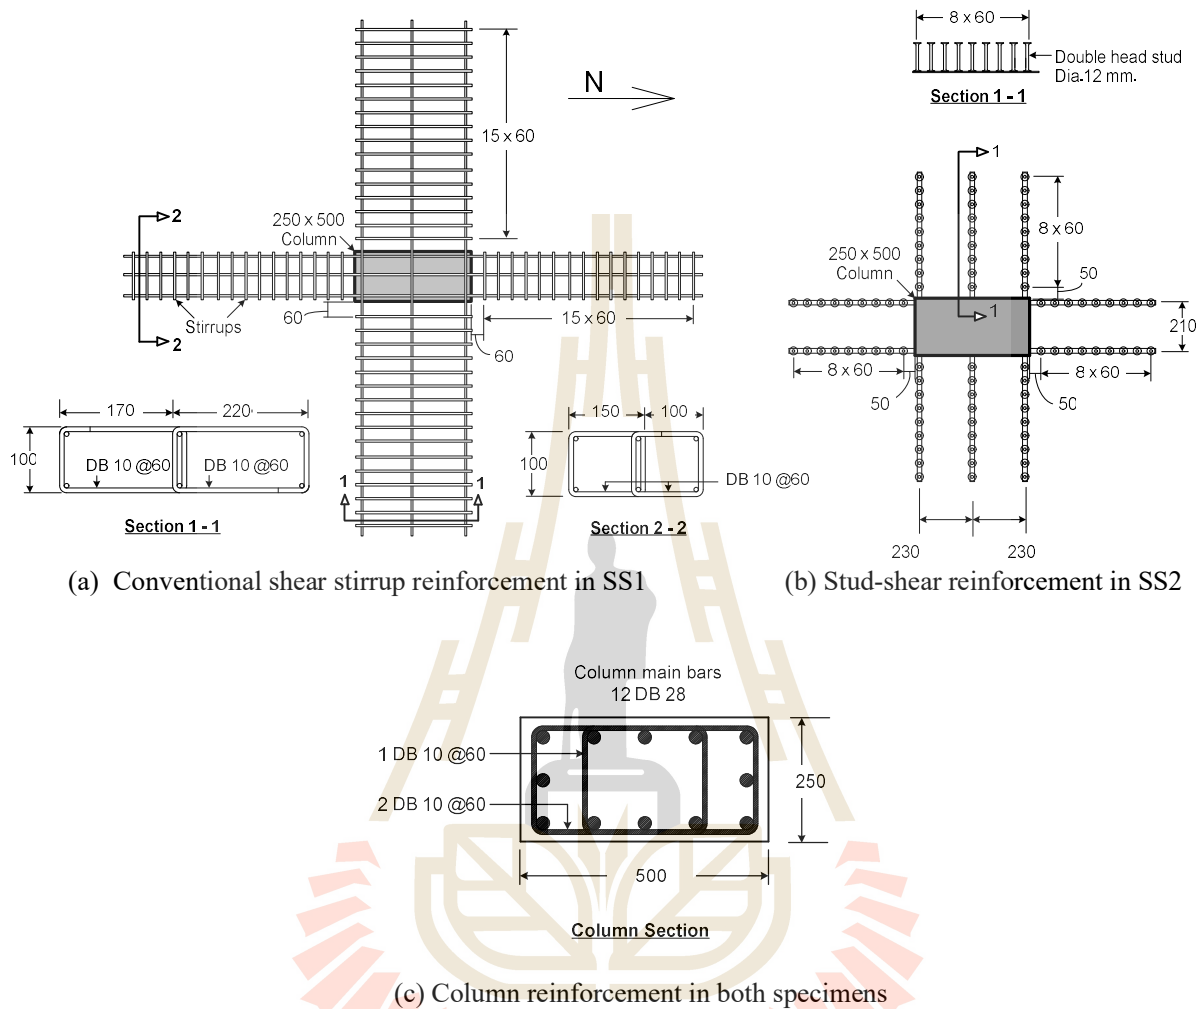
Details of shear reinforcement in PT slabs and column reinforcement of the test specimens
